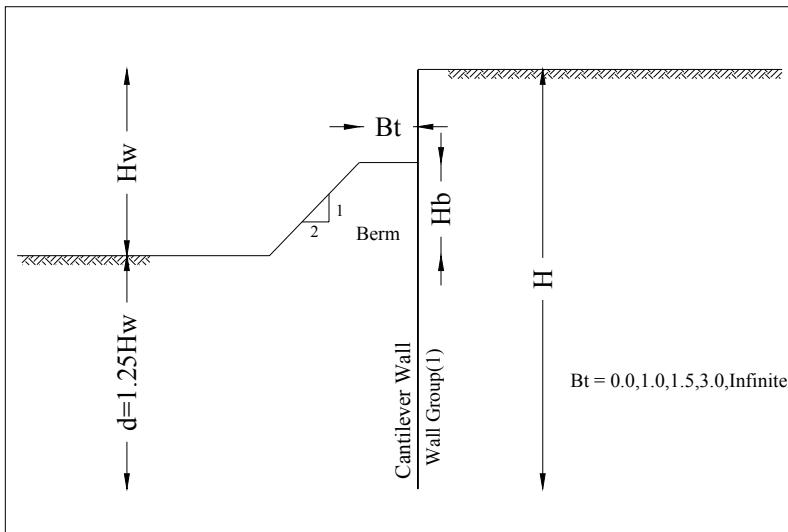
Geometry of the Bermed Wall with Different Top Berm Widths
